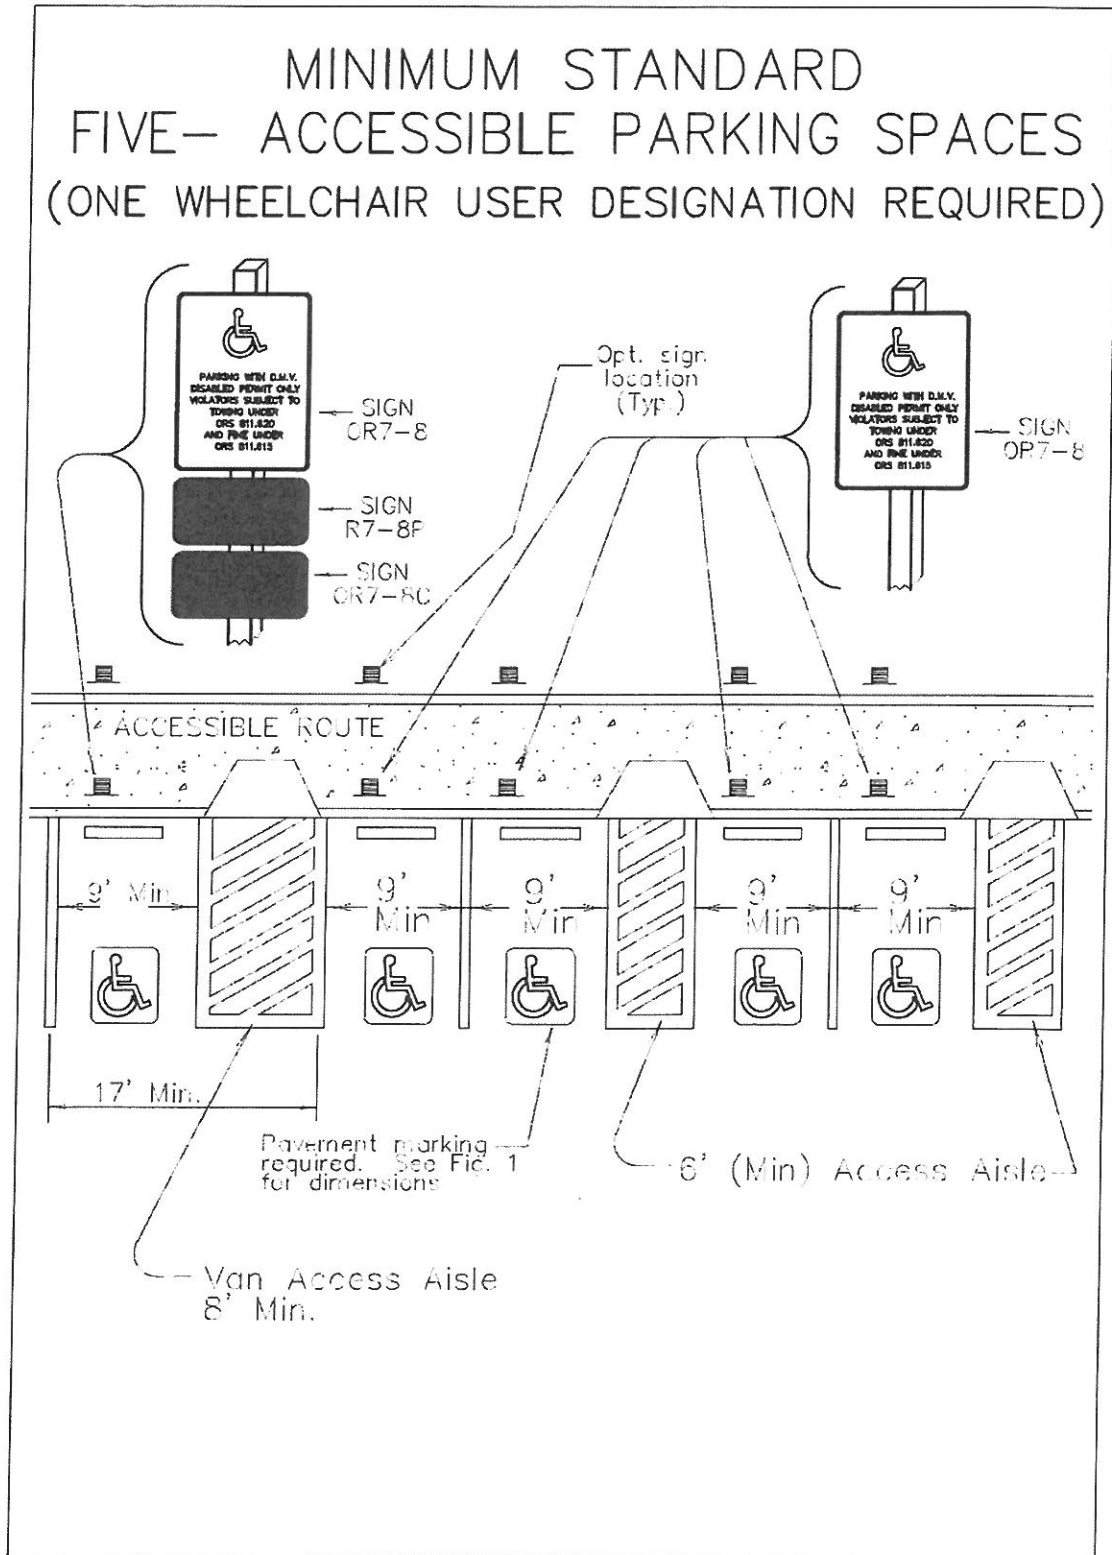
F(4) Minimum Standard Five-Accessible Parking Spaces
